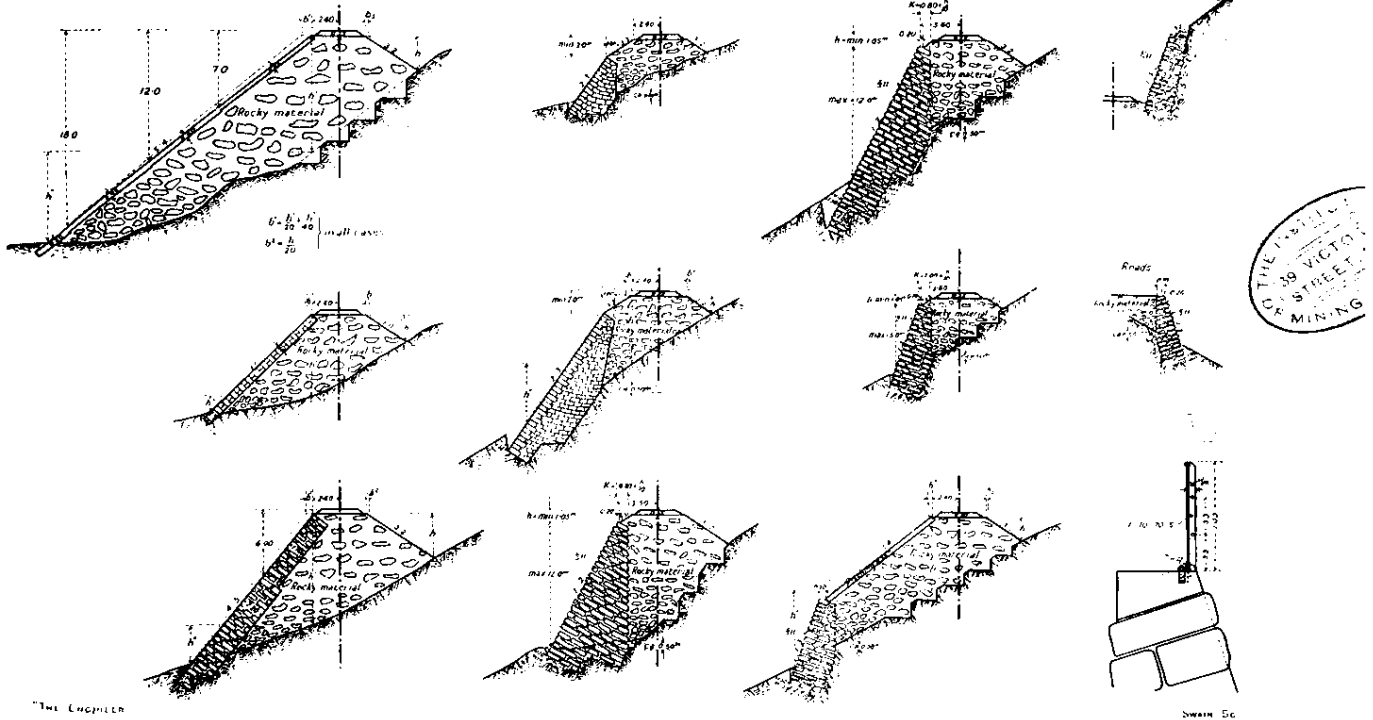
TYPICAL SECTIONS OF EMBANKMENTS WITH STONE FACING AND DRY STONE WALLS
